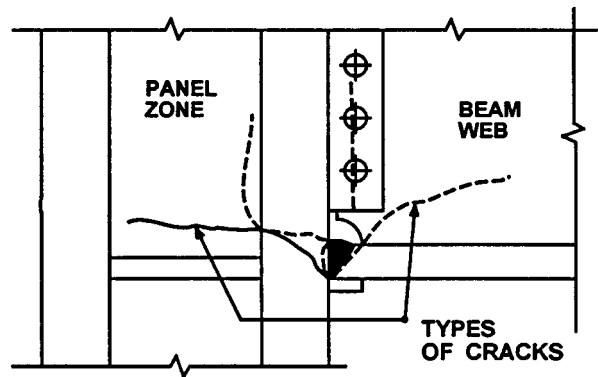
Common crack formations in welded beam-to-column connections [3].
